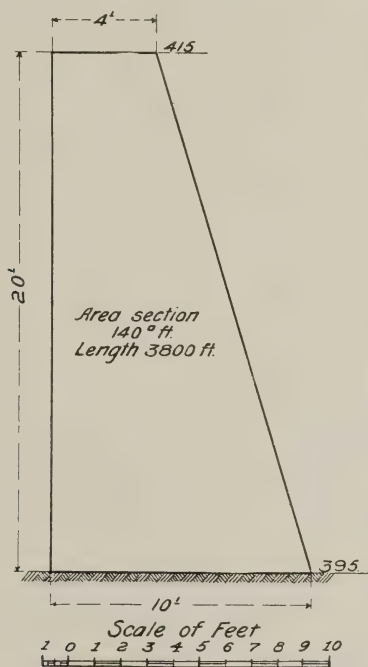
Average section of dike between Ware Rock and Rock Island. Same remarks as for previous sections as to cross section.
